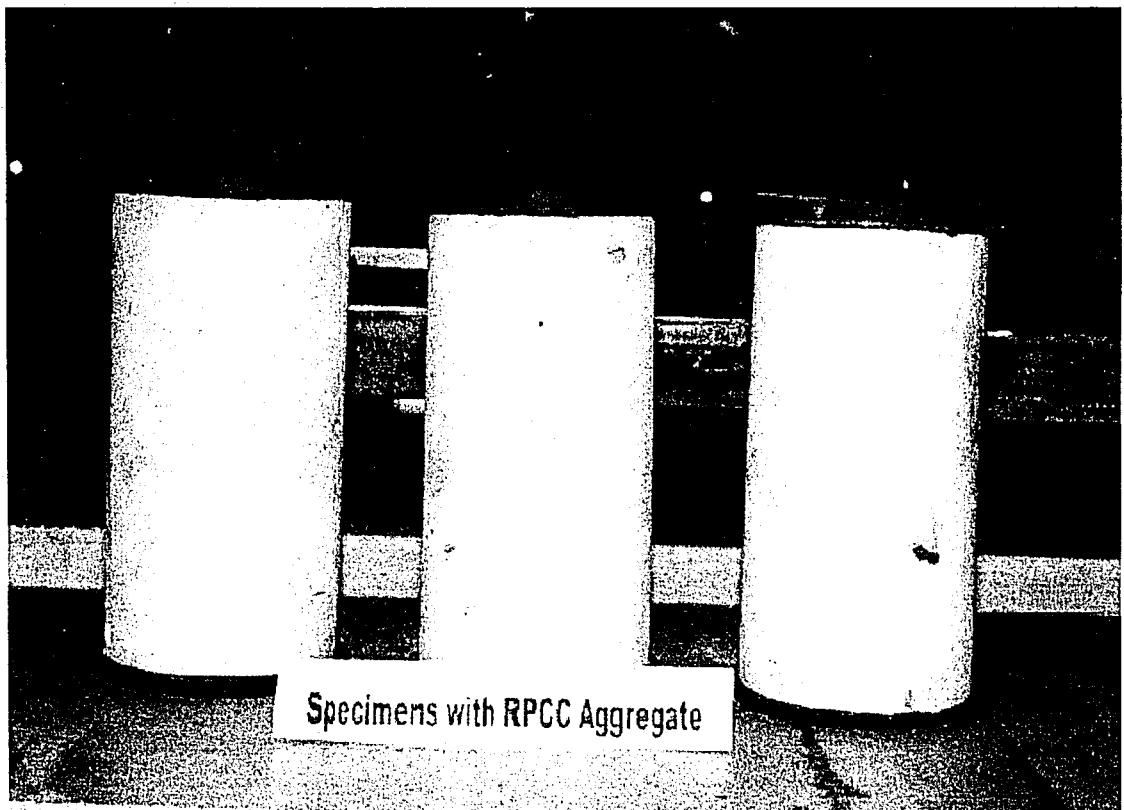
Cylindrical Concrete Specimens Made with RPCC Aggregate.
